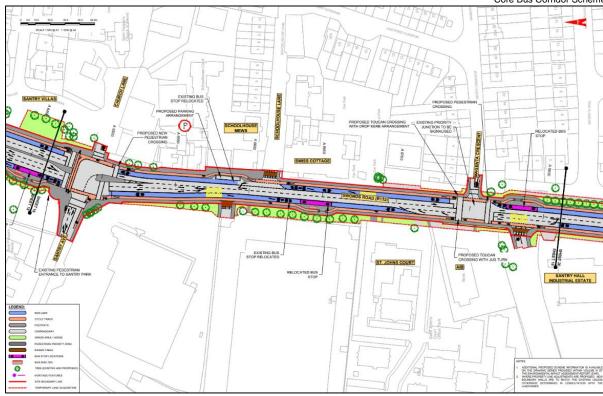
Extract from General Arrangement Drawing (Sheet 19)
